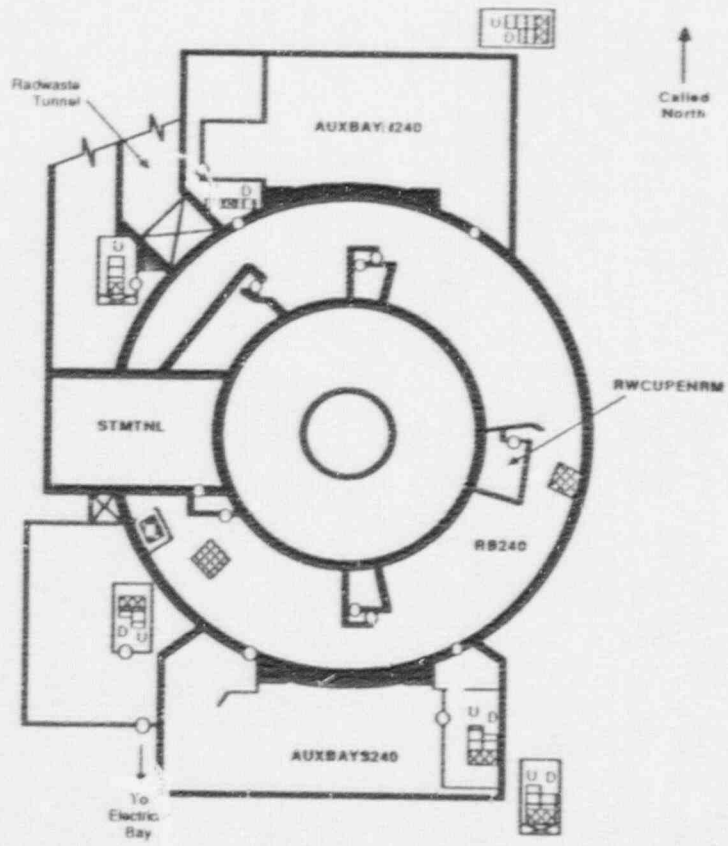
Nine Mile Point 2 Reactor Building, Elevation 240'-0"
